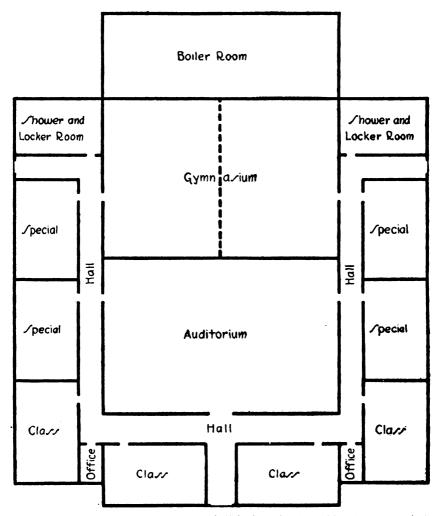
Exhibit C.—Suggested addition for Oconee School This plan, with the addition of two rooms, is also applicable for Baxter School.
